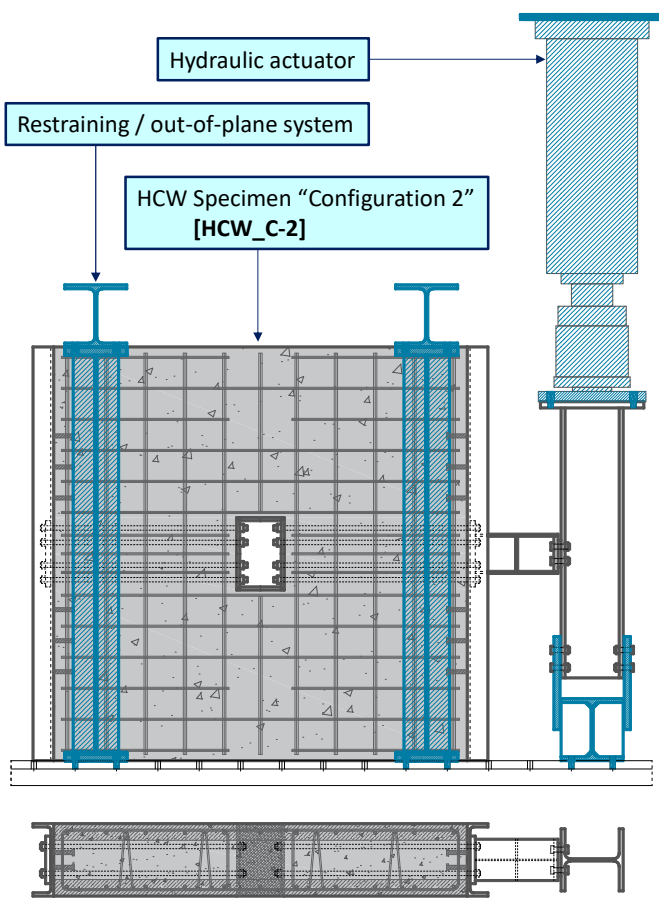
Experimental test set-up and "HCW_C-2" specimen
